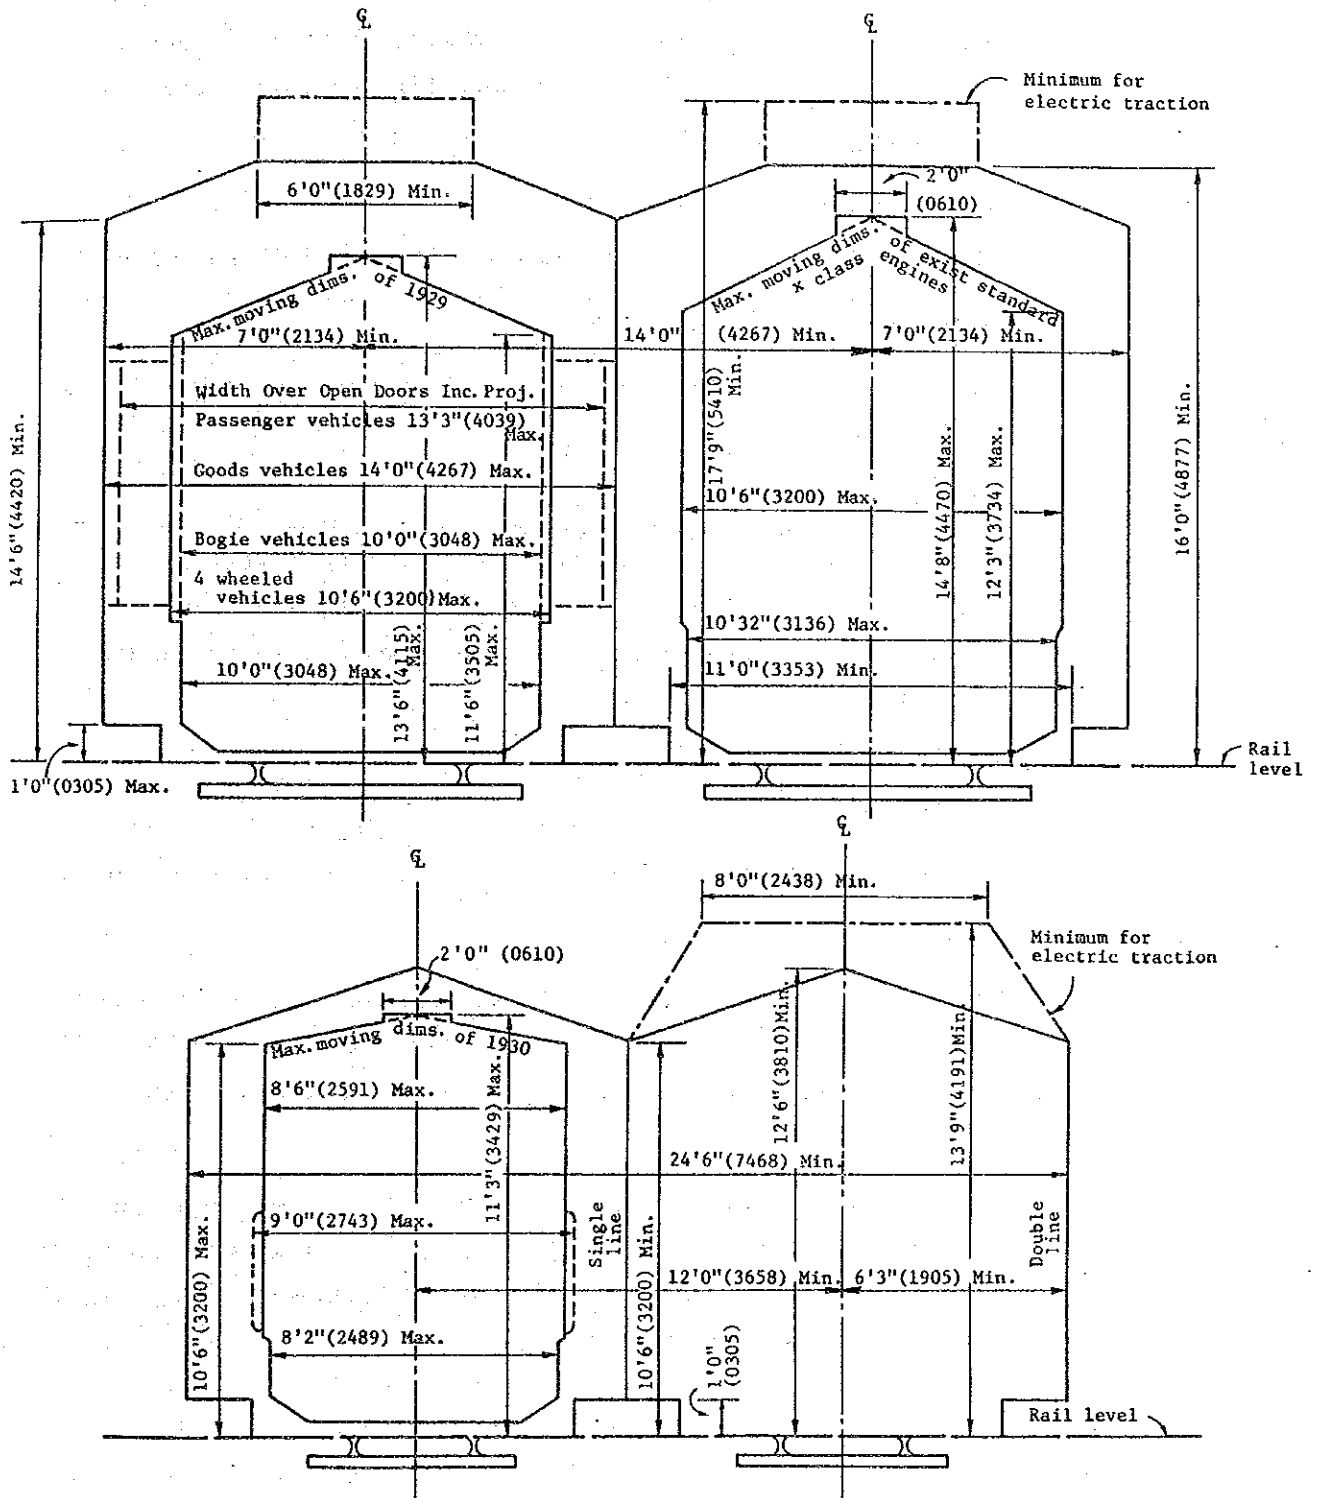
Loading and Structure Design Diagrams for BR
